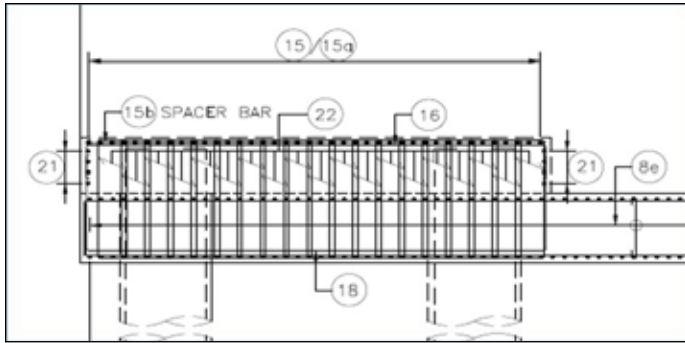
Longitudinal Sectional View Showing Dowels Left in the Bottom Slab and Walls for Pile-Pile-Cap and Box Integration
